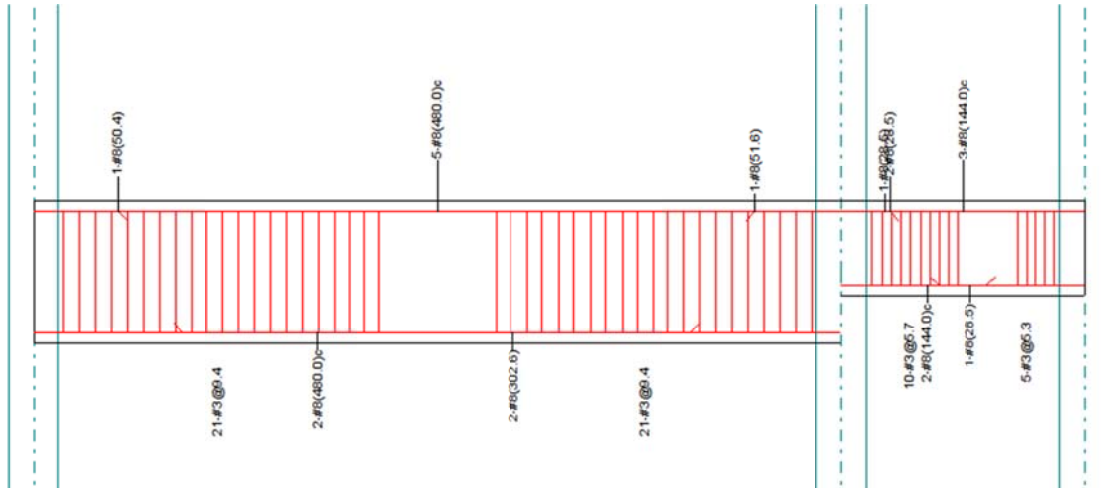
spBeam Column Line B Reinforcing Diagram (Lateral Loads)
